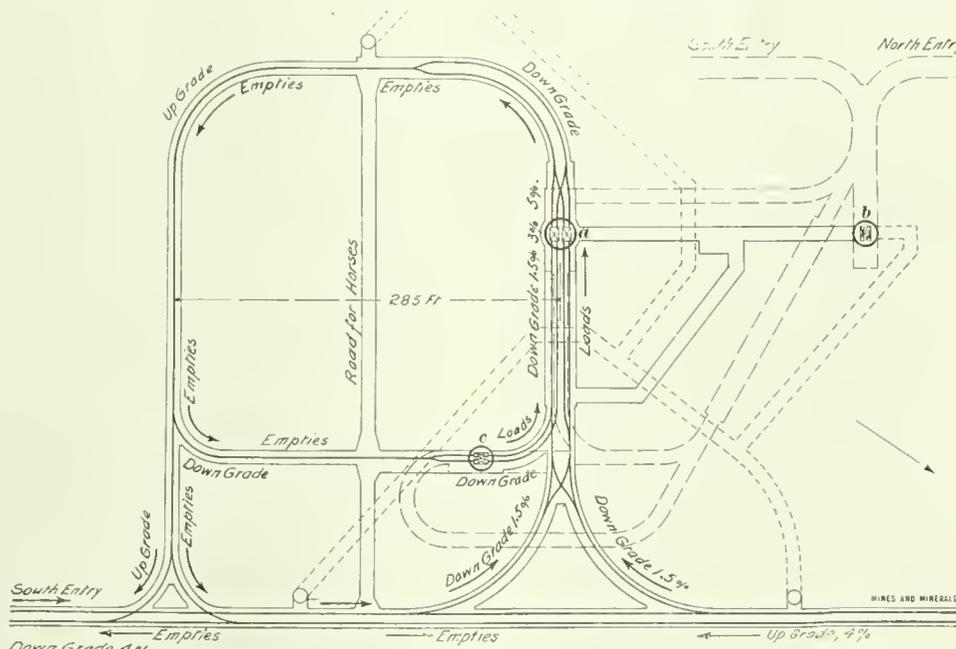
PLAN OF SHAFT BOTTOM AT ARENBERG MINE
